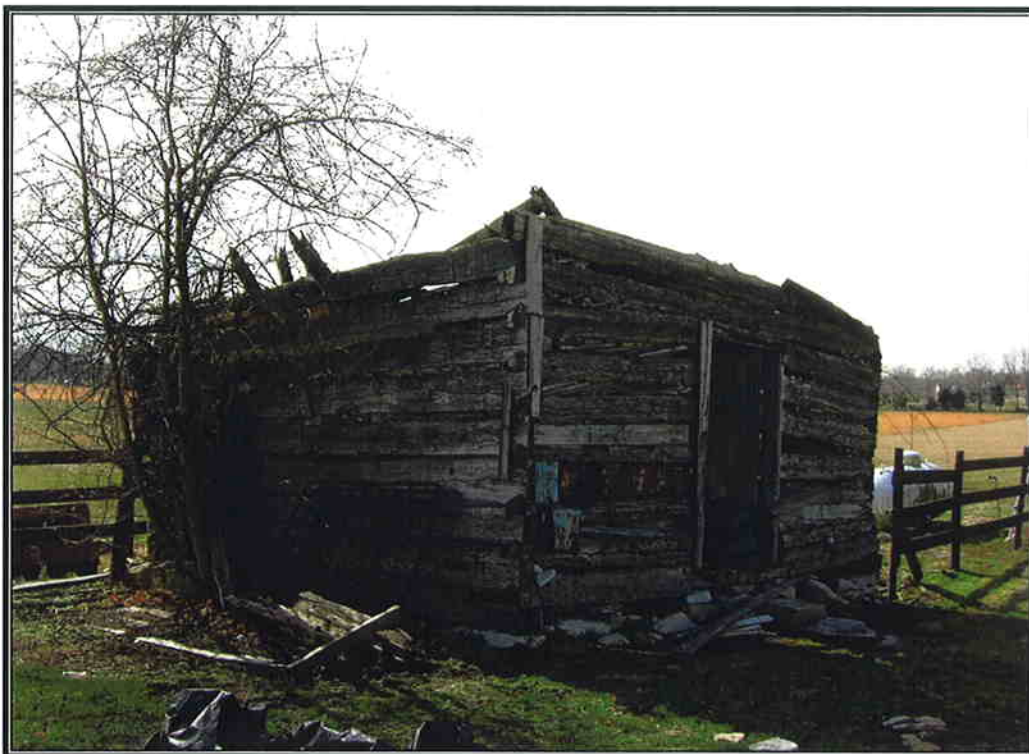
Site 4, Remains of second log structure looking to the southwest.
